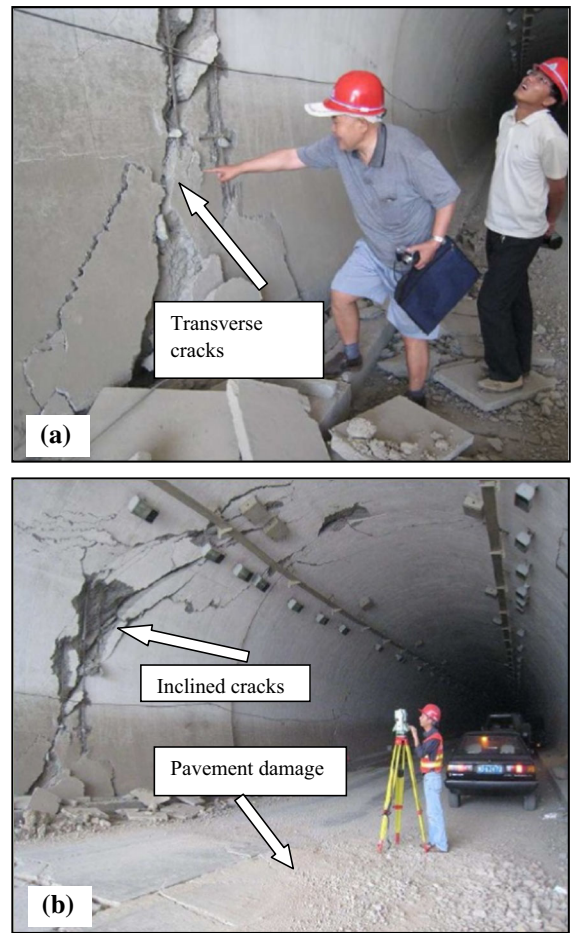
Damages at Longchi tunnel (modified after Tao et al. 2011): a transverse cracking of liner, b inclined cracks and pavement damage
